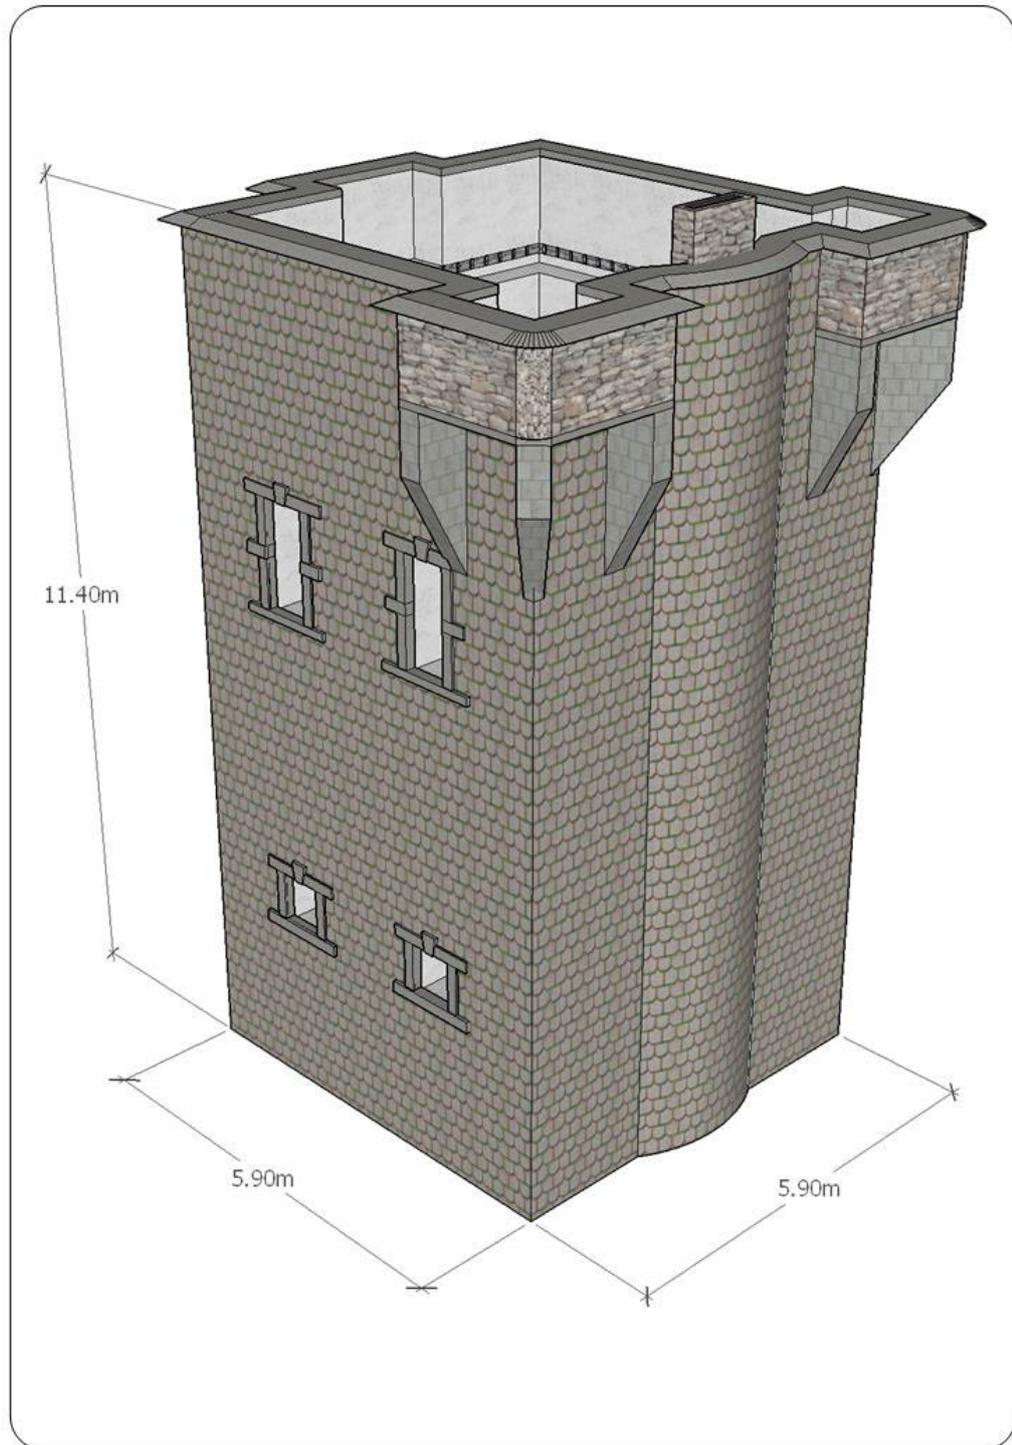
Oblique external view of rendered 3D model for an idealised signal tower showing rear wall and side wall.
